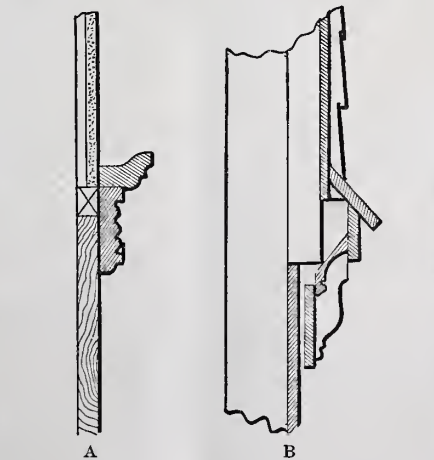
A, Section Through Chalk Shelf, Scale, $1\frac{1}{2}$ Inches to the Foot; B, Section Through Belt Course Across Side Gable, Scale $\frac{3}{4}$ Inch to the Foot.
